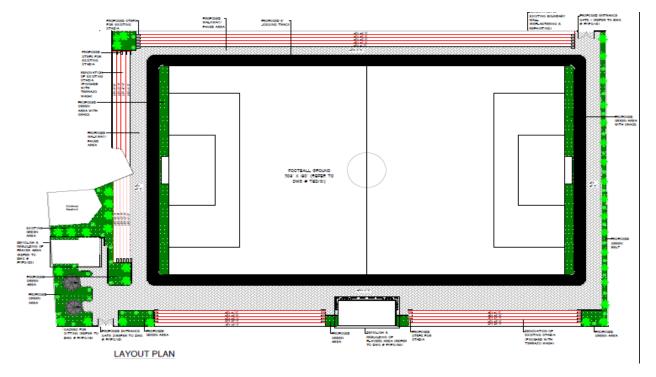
Proposed Layout Plan of Mehfooz Football Ground
